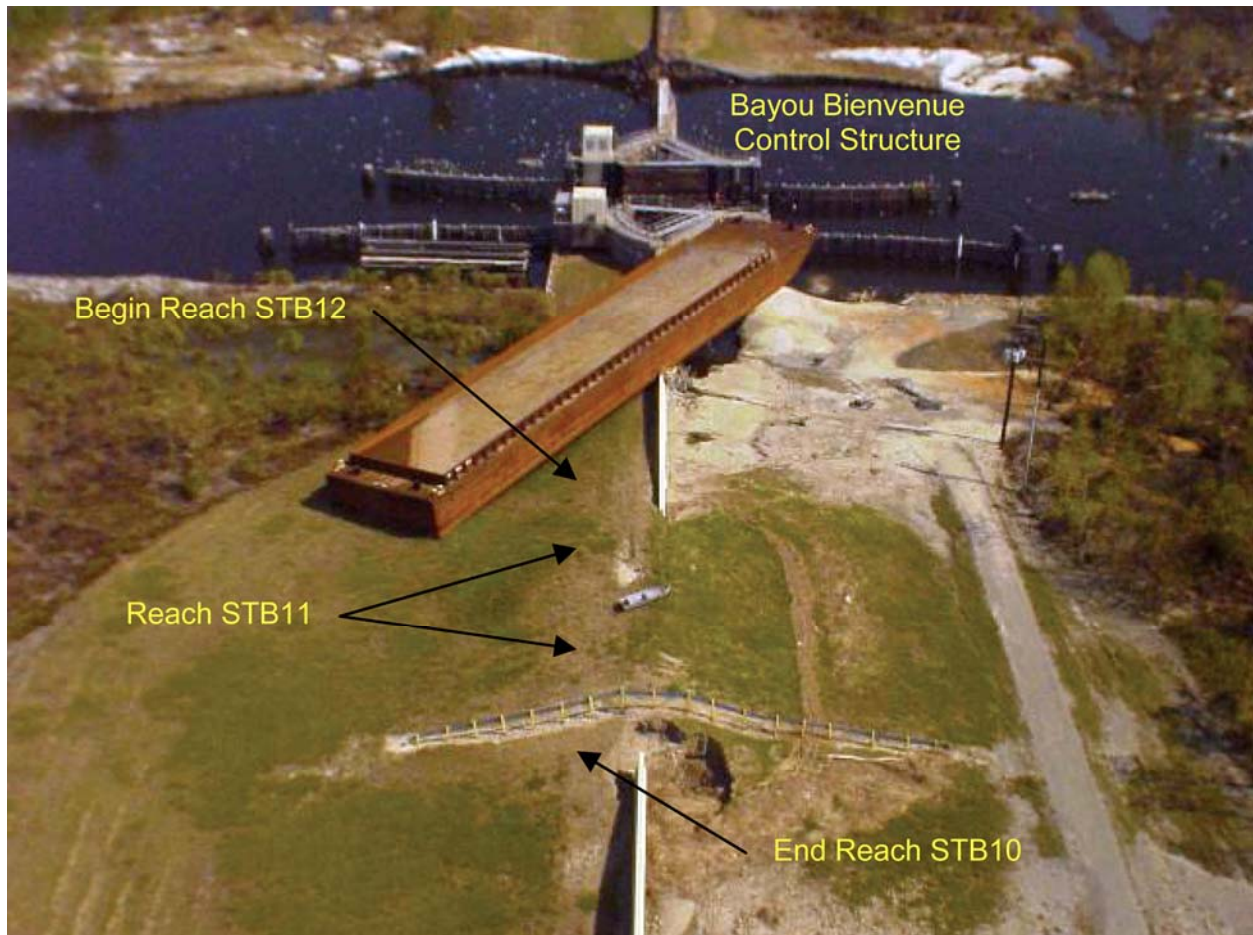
Short levee section between floodwalls (Reach STB11)
